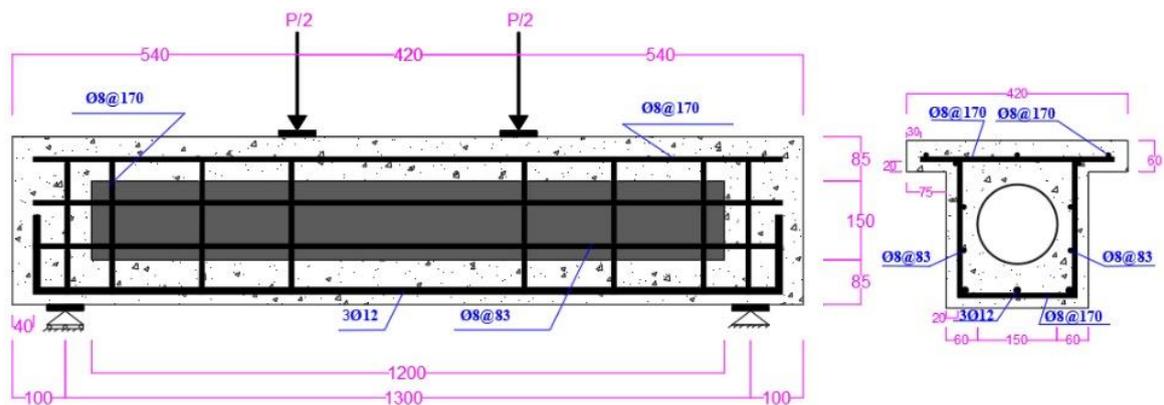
Dimensions and reinforcement details of (BCCSPS) (all units are in mm)
